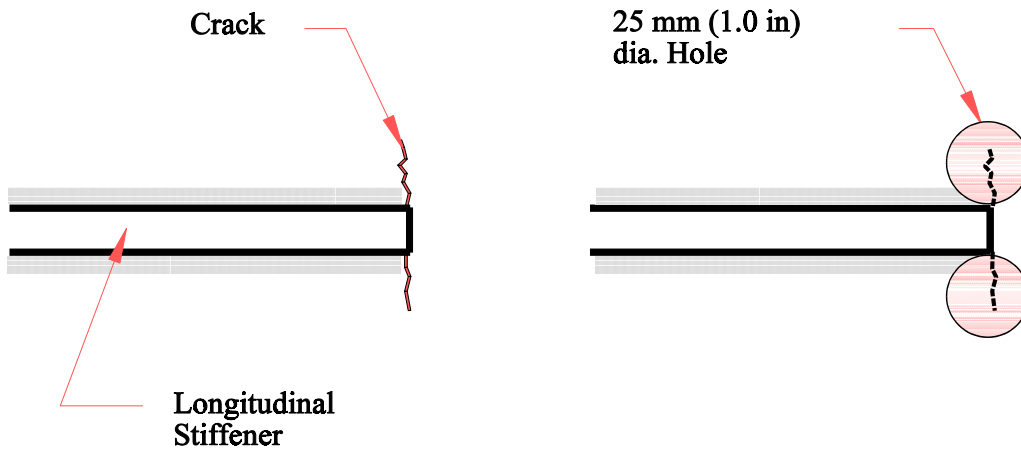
Crack and drilled holes at end of longitudinal stiffeners.
